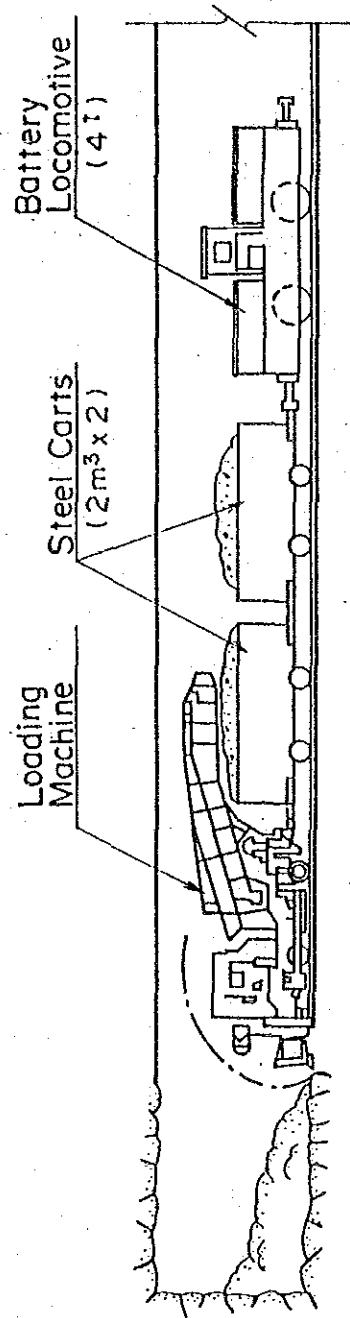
Loading Machine of Tunnel Excavation
